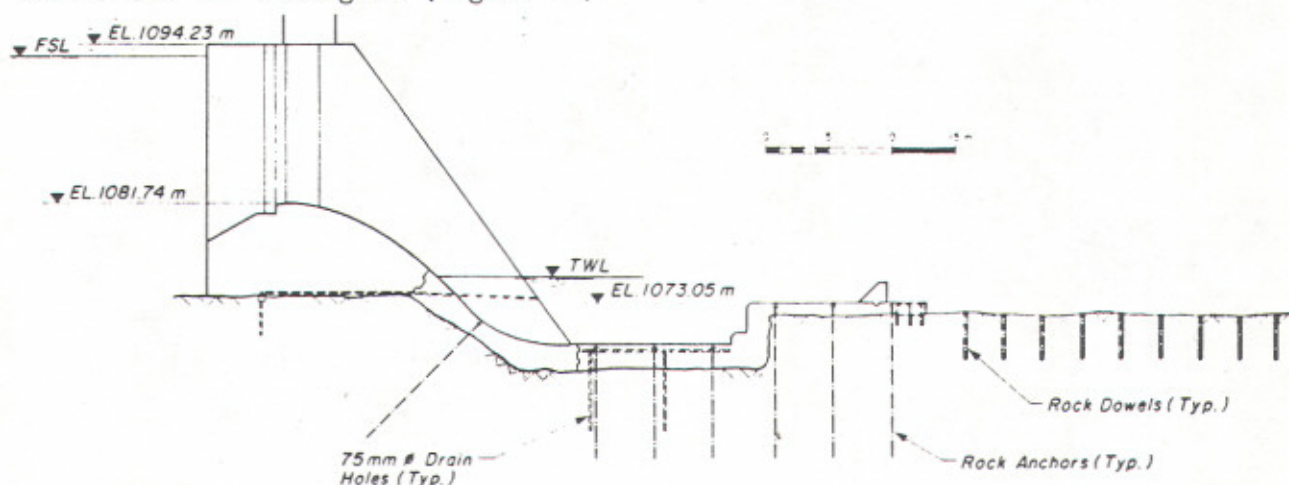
SECTION THROUGH MODIFIED BEARSPAW SPILLWAY
